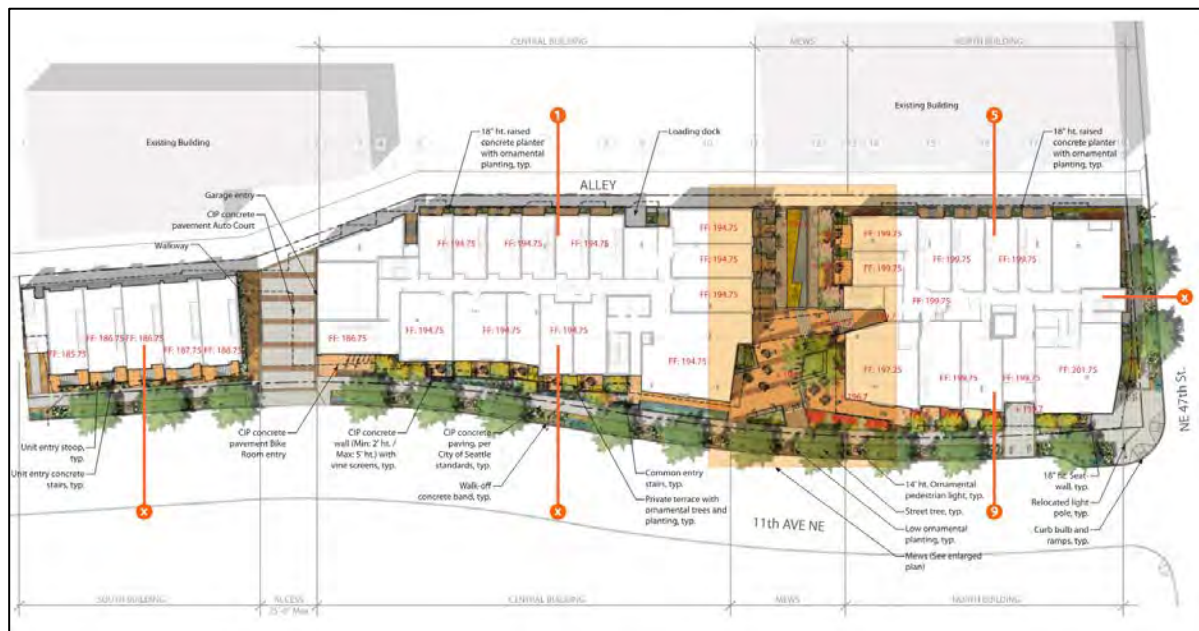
Illustrated Site Plan, pg. 20 of the DRB Recommendation Packet (North is to the right)
